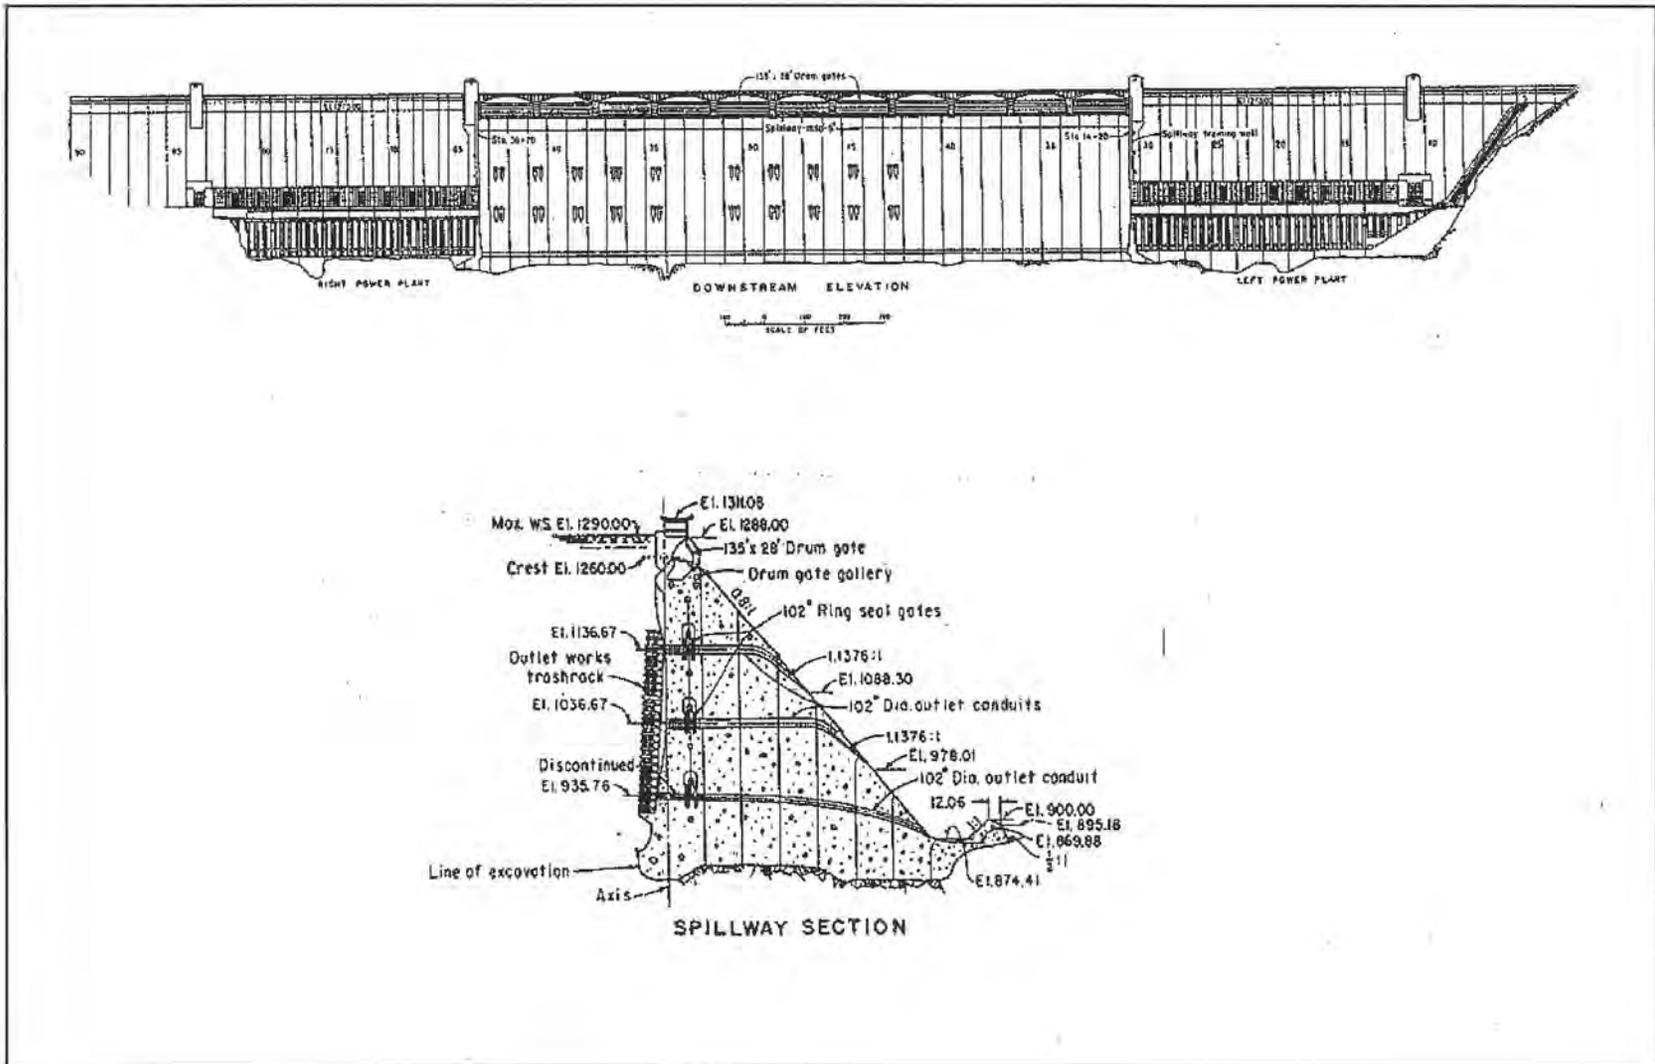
Downstream elevation and spillway section of Grand Coulee Dam. The downstream view shows the drum-gated spillway, the location of the outlet works on the face of the dam, and the left and right power plants. The spillway section shows the relative locations and the elevations of the spillway, outlet works conduits, and roller bucket energy dissipater. (fn:pl§.bmp)
